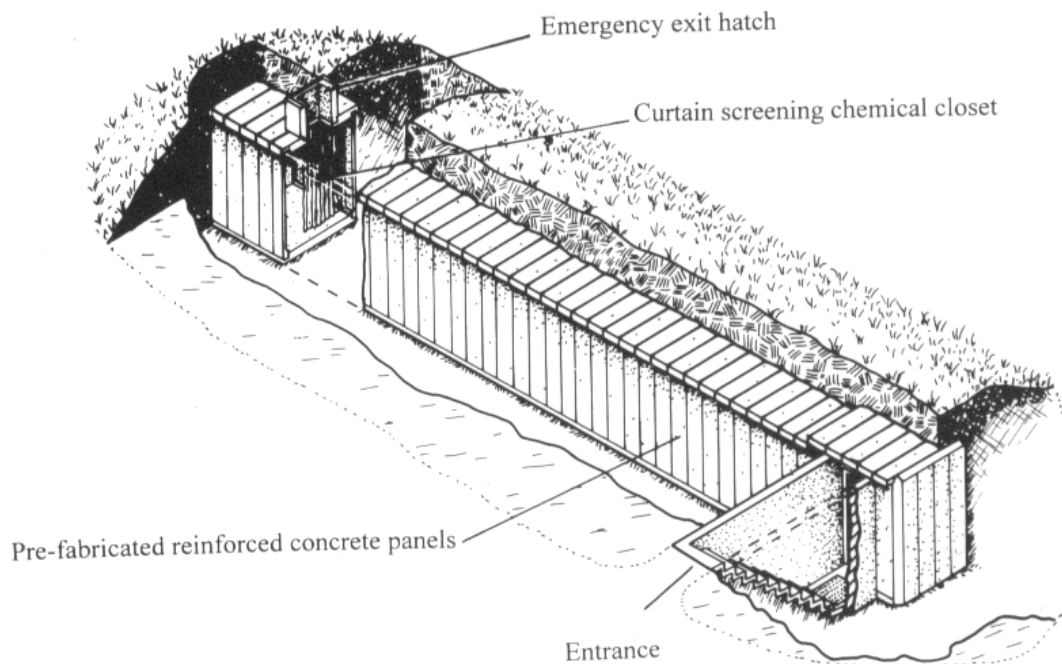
Typical trench shelter construction (after Brown et al 1996)
